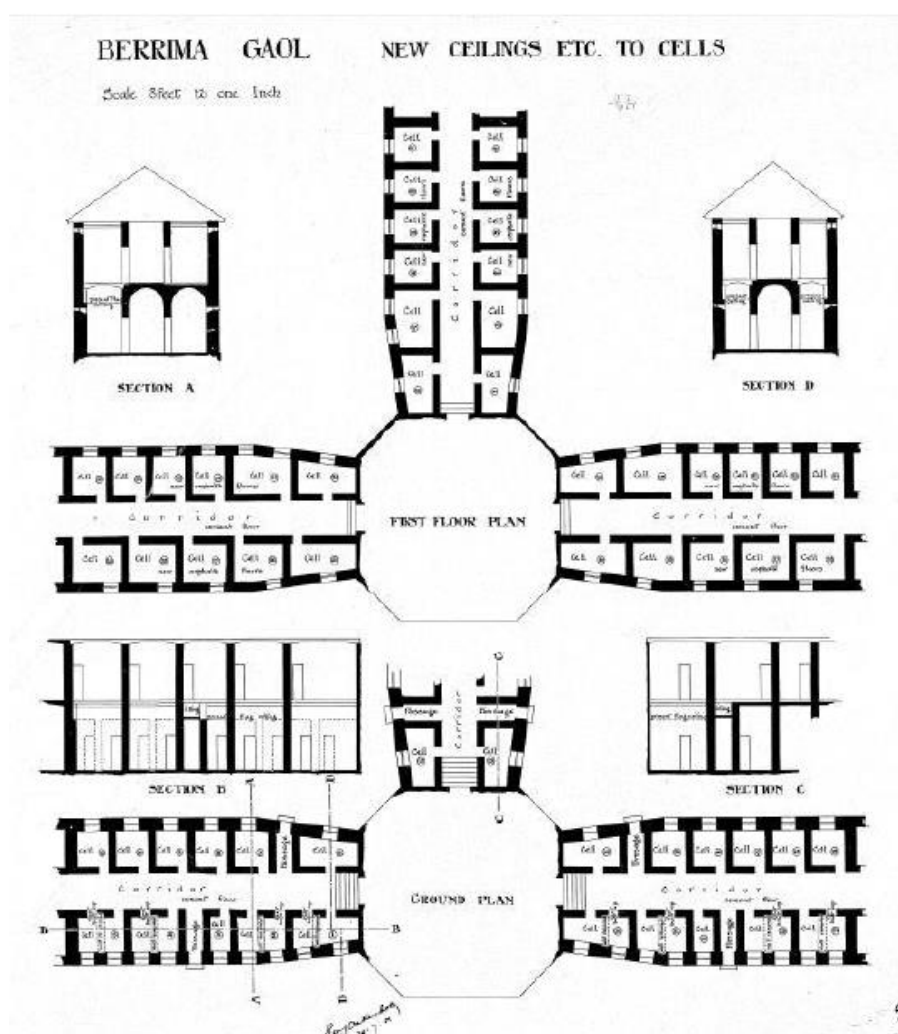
29 July 1901 plan outlining the proposed changes to enlarge the ground floor cells and demolition of walls between cells and replacement of existing ceilings.
